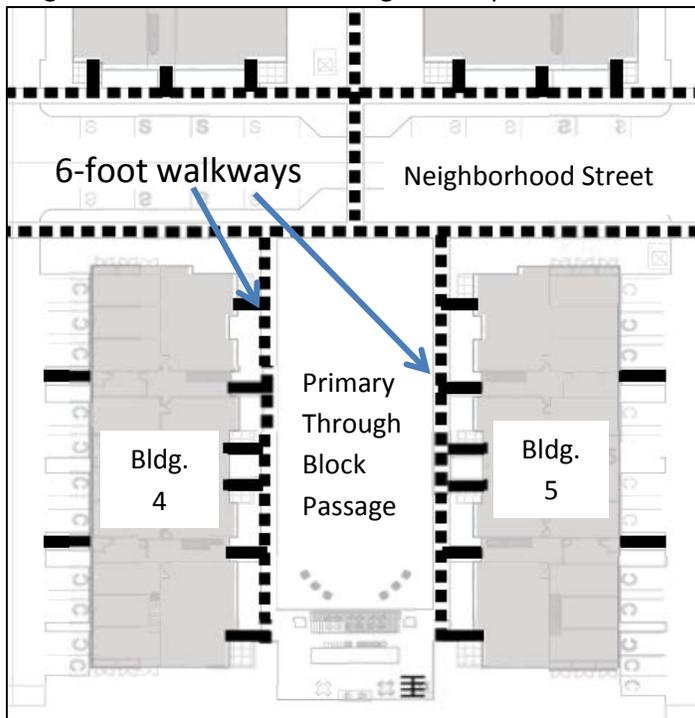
Modified Primary Through Block Passage at Central Greenspace
